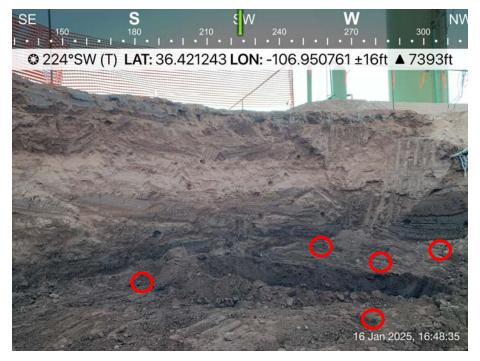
SS18 collected as a five-point composite sample from southwest base of excavation.
